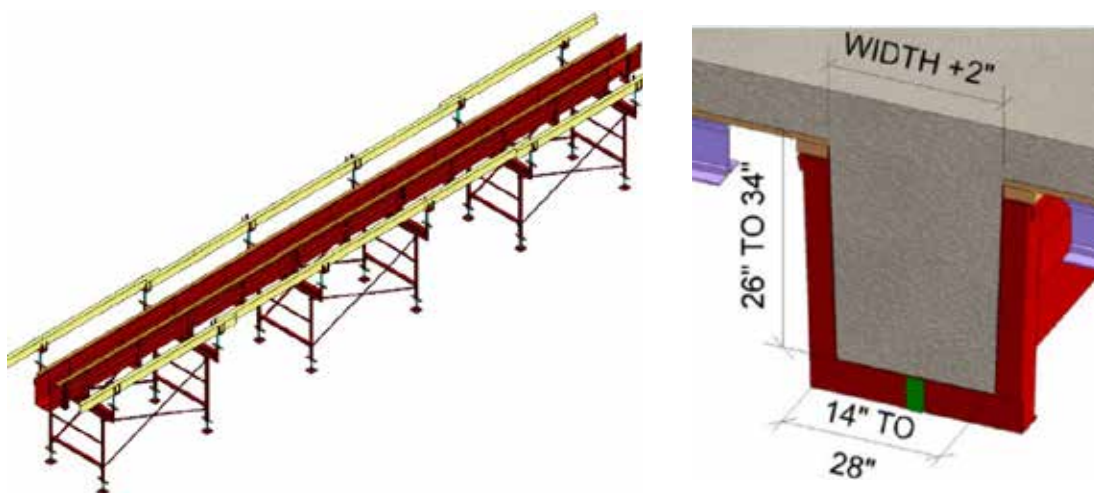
Single-piece forms are commonly used to construct repetitive long-span beams in parking structures. The form sides of such systems can resist fresh concrete pressures without the need for tie rods. (Image courtesy of Ceco Concrete Construction.)
